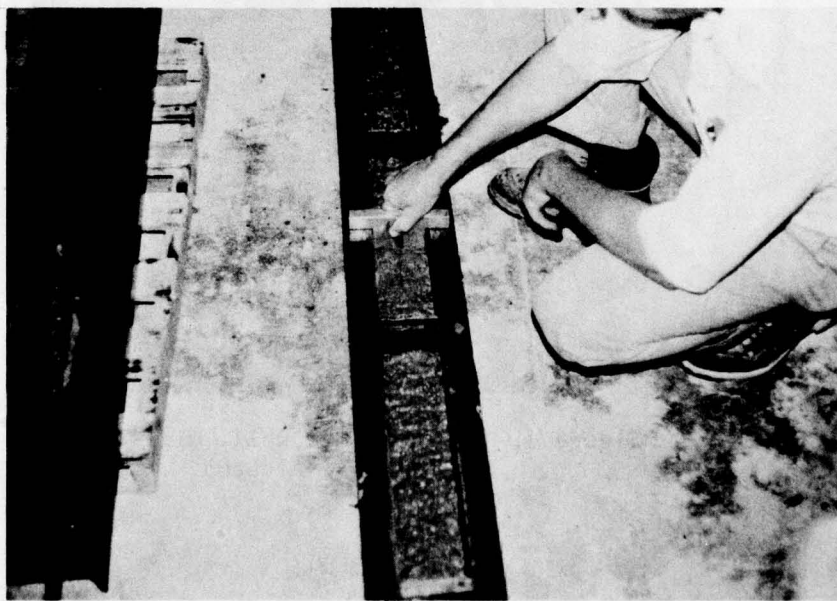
Troy Lock and Dam, Hudson River, Troy, New York
